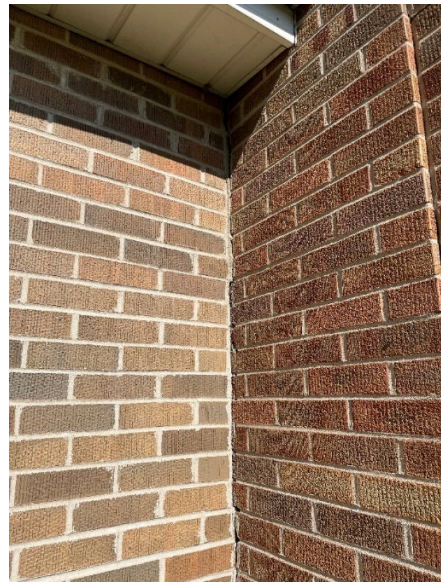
Crack between storage addition and existing masonry
